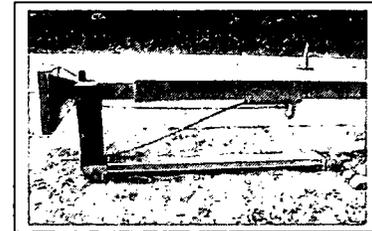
Box Beam Guiderail Type III WYBET End Terminal
